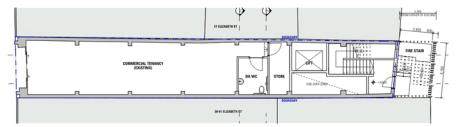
Ground Floor plan (Elizabeth St level) (JAWS, 2020)
